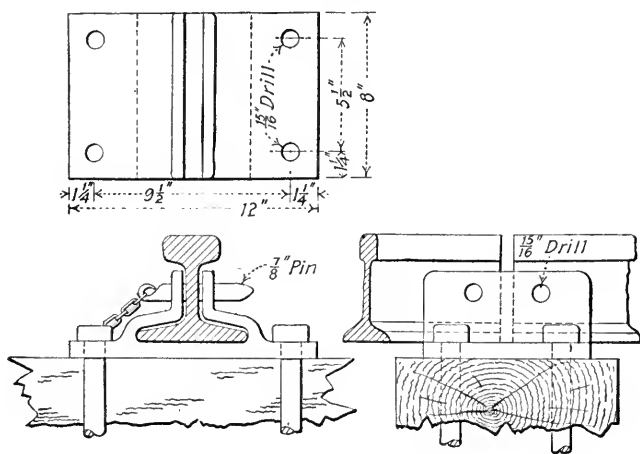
CAST-STEEL TRACK CONNECTIONS.
